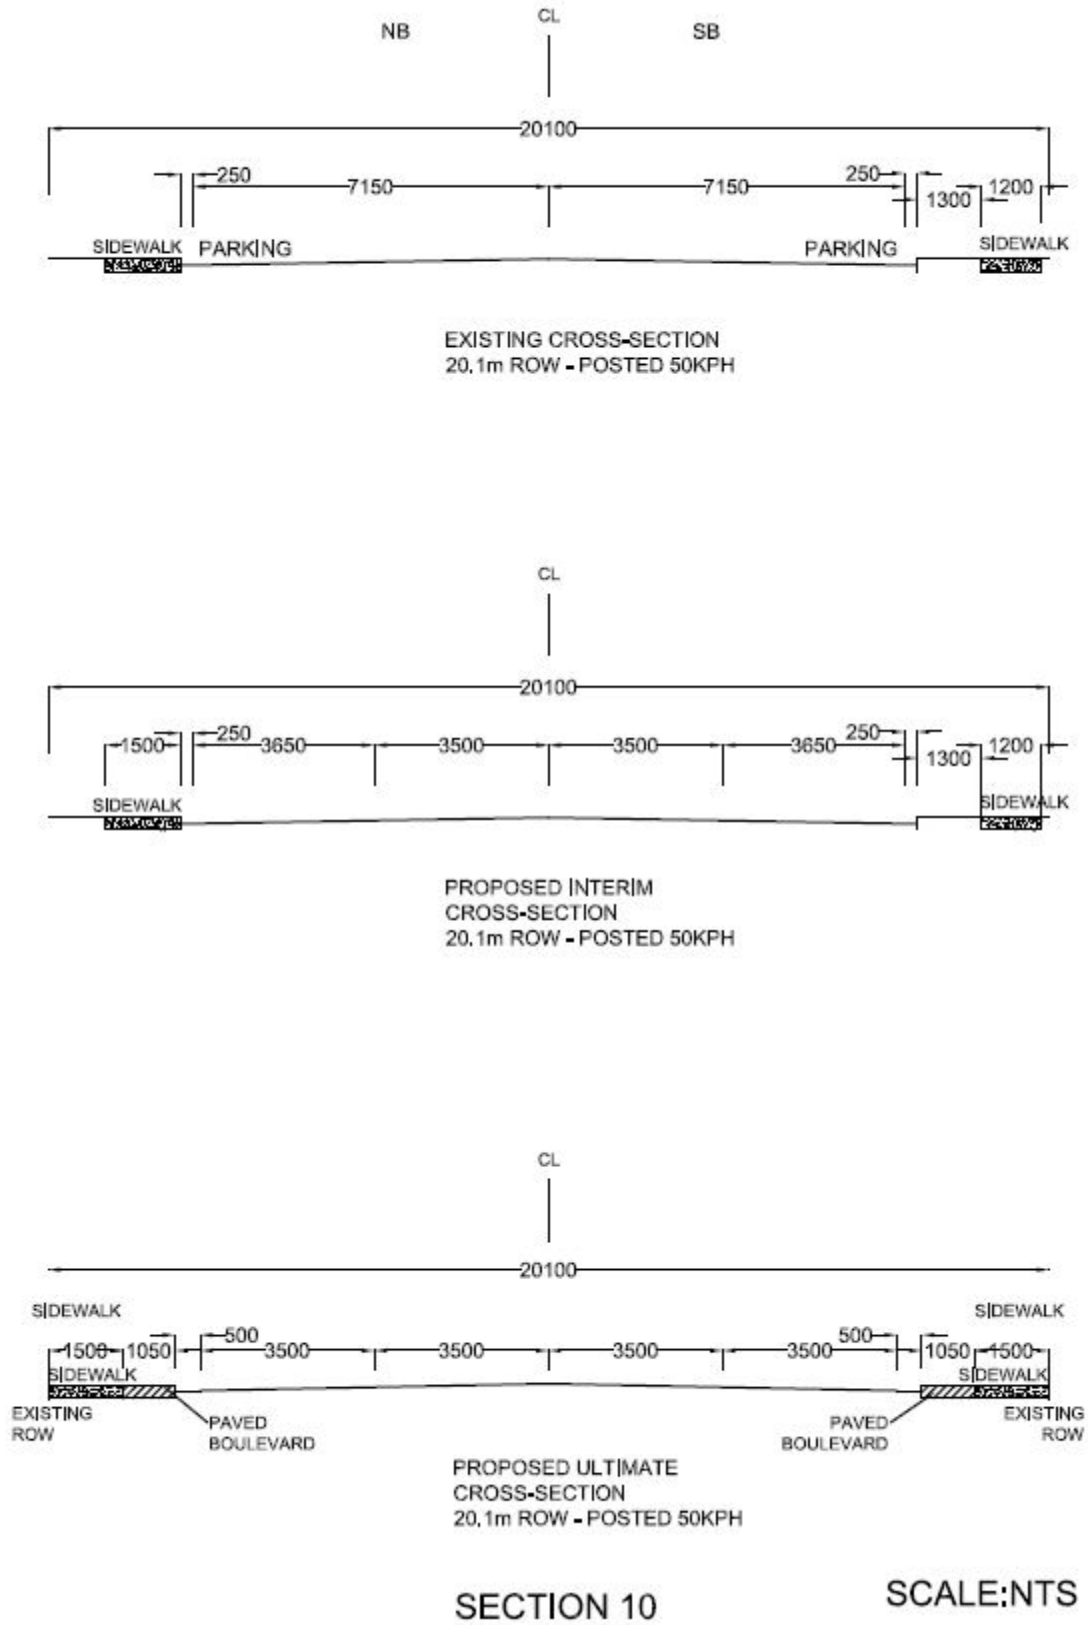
Proposed Section 10 – Hwy 22 South of 1st Ave
